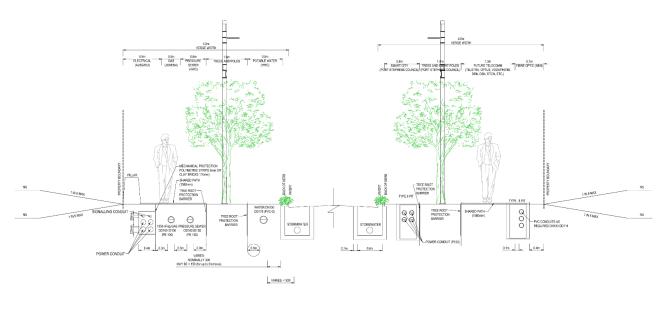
Local Industrial Road with drainage channel typical cross section
